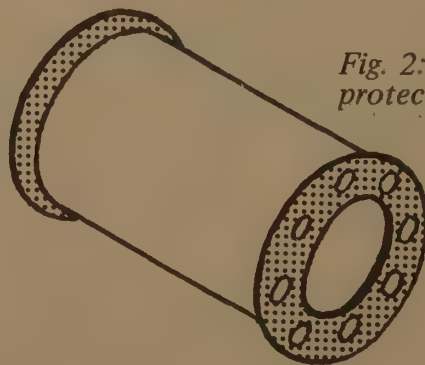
Piss-poor metal ducts sold for protecting wall around stovepipe:
